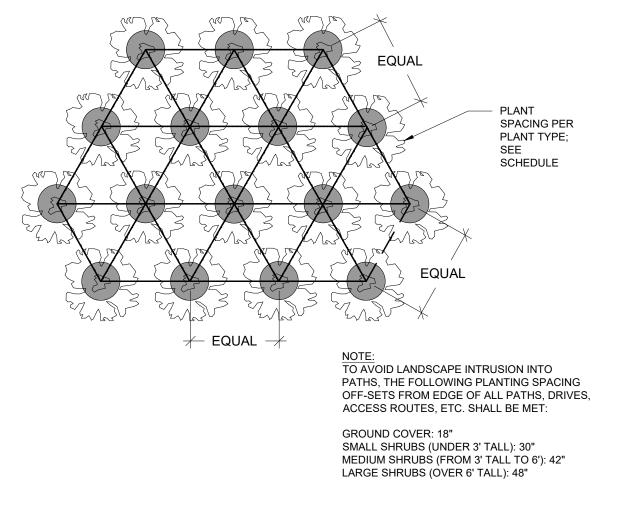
DETAIL: PLANTING GROUNDCOVER NOT TO SCALE
